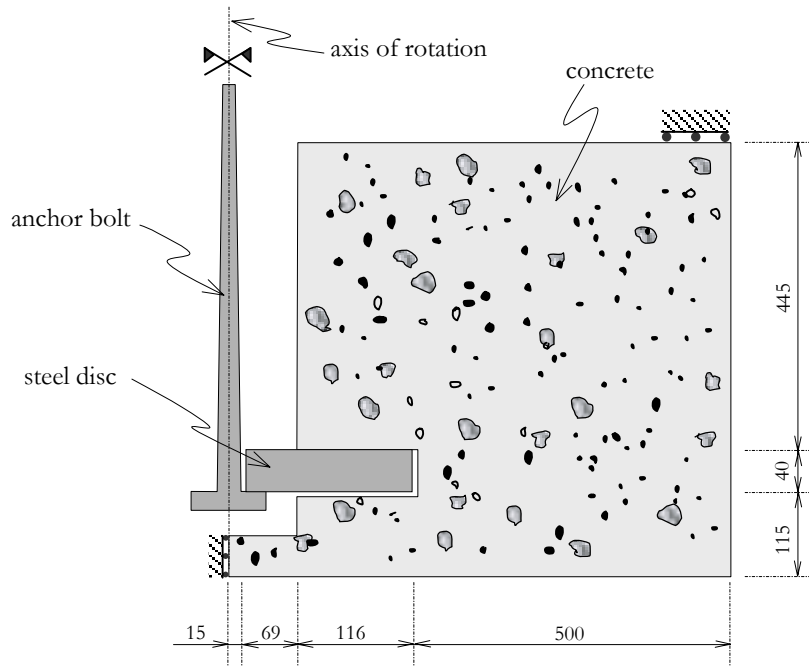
Detail of the anchorage structure – dimensions in *mm*.
